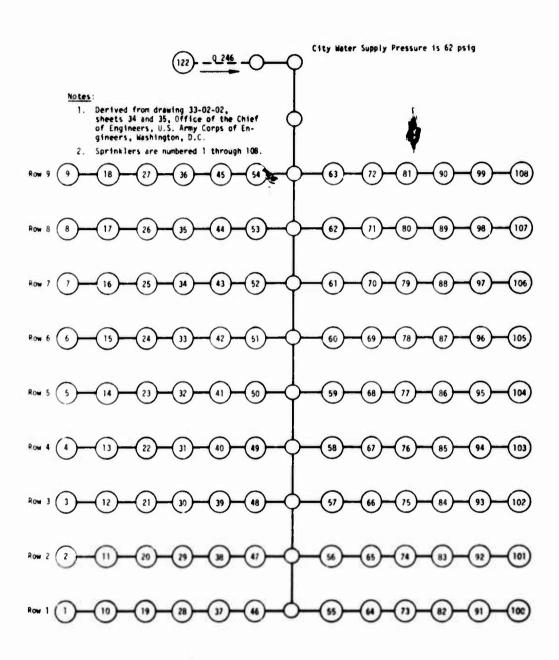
Sprinkler System in Buildings 10, 18, and 412 at Tinker Air Force Base
